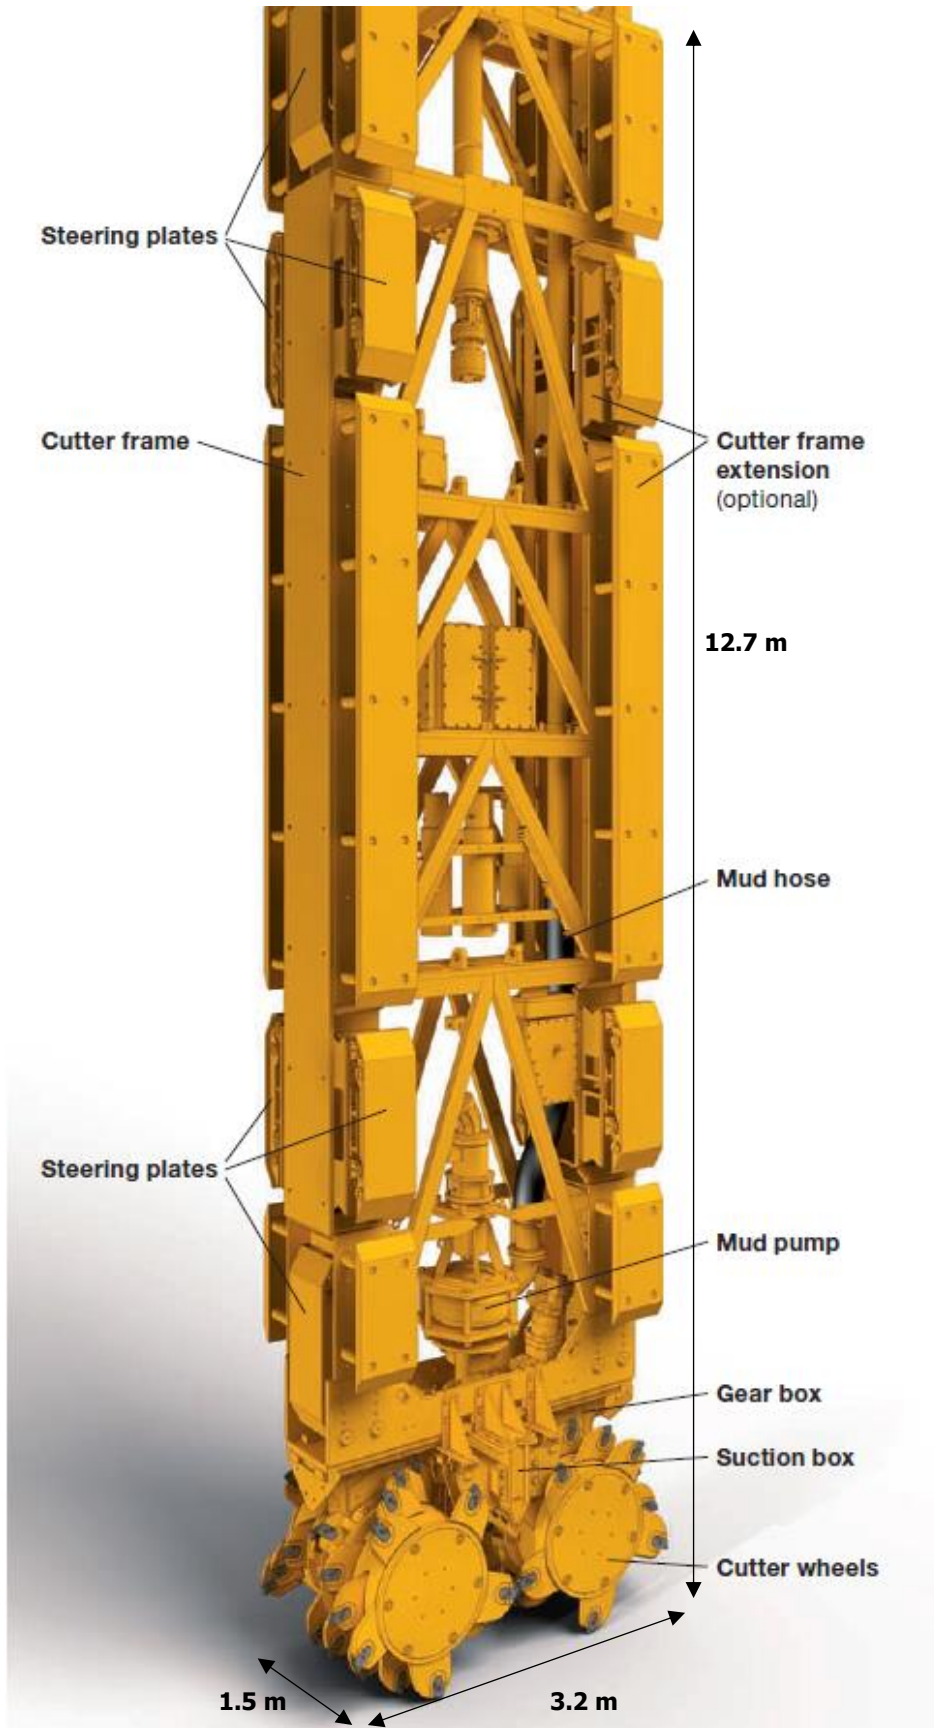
Main components of Bauer Trench cutter, dimensions given for a BC 50 cutter [34]
